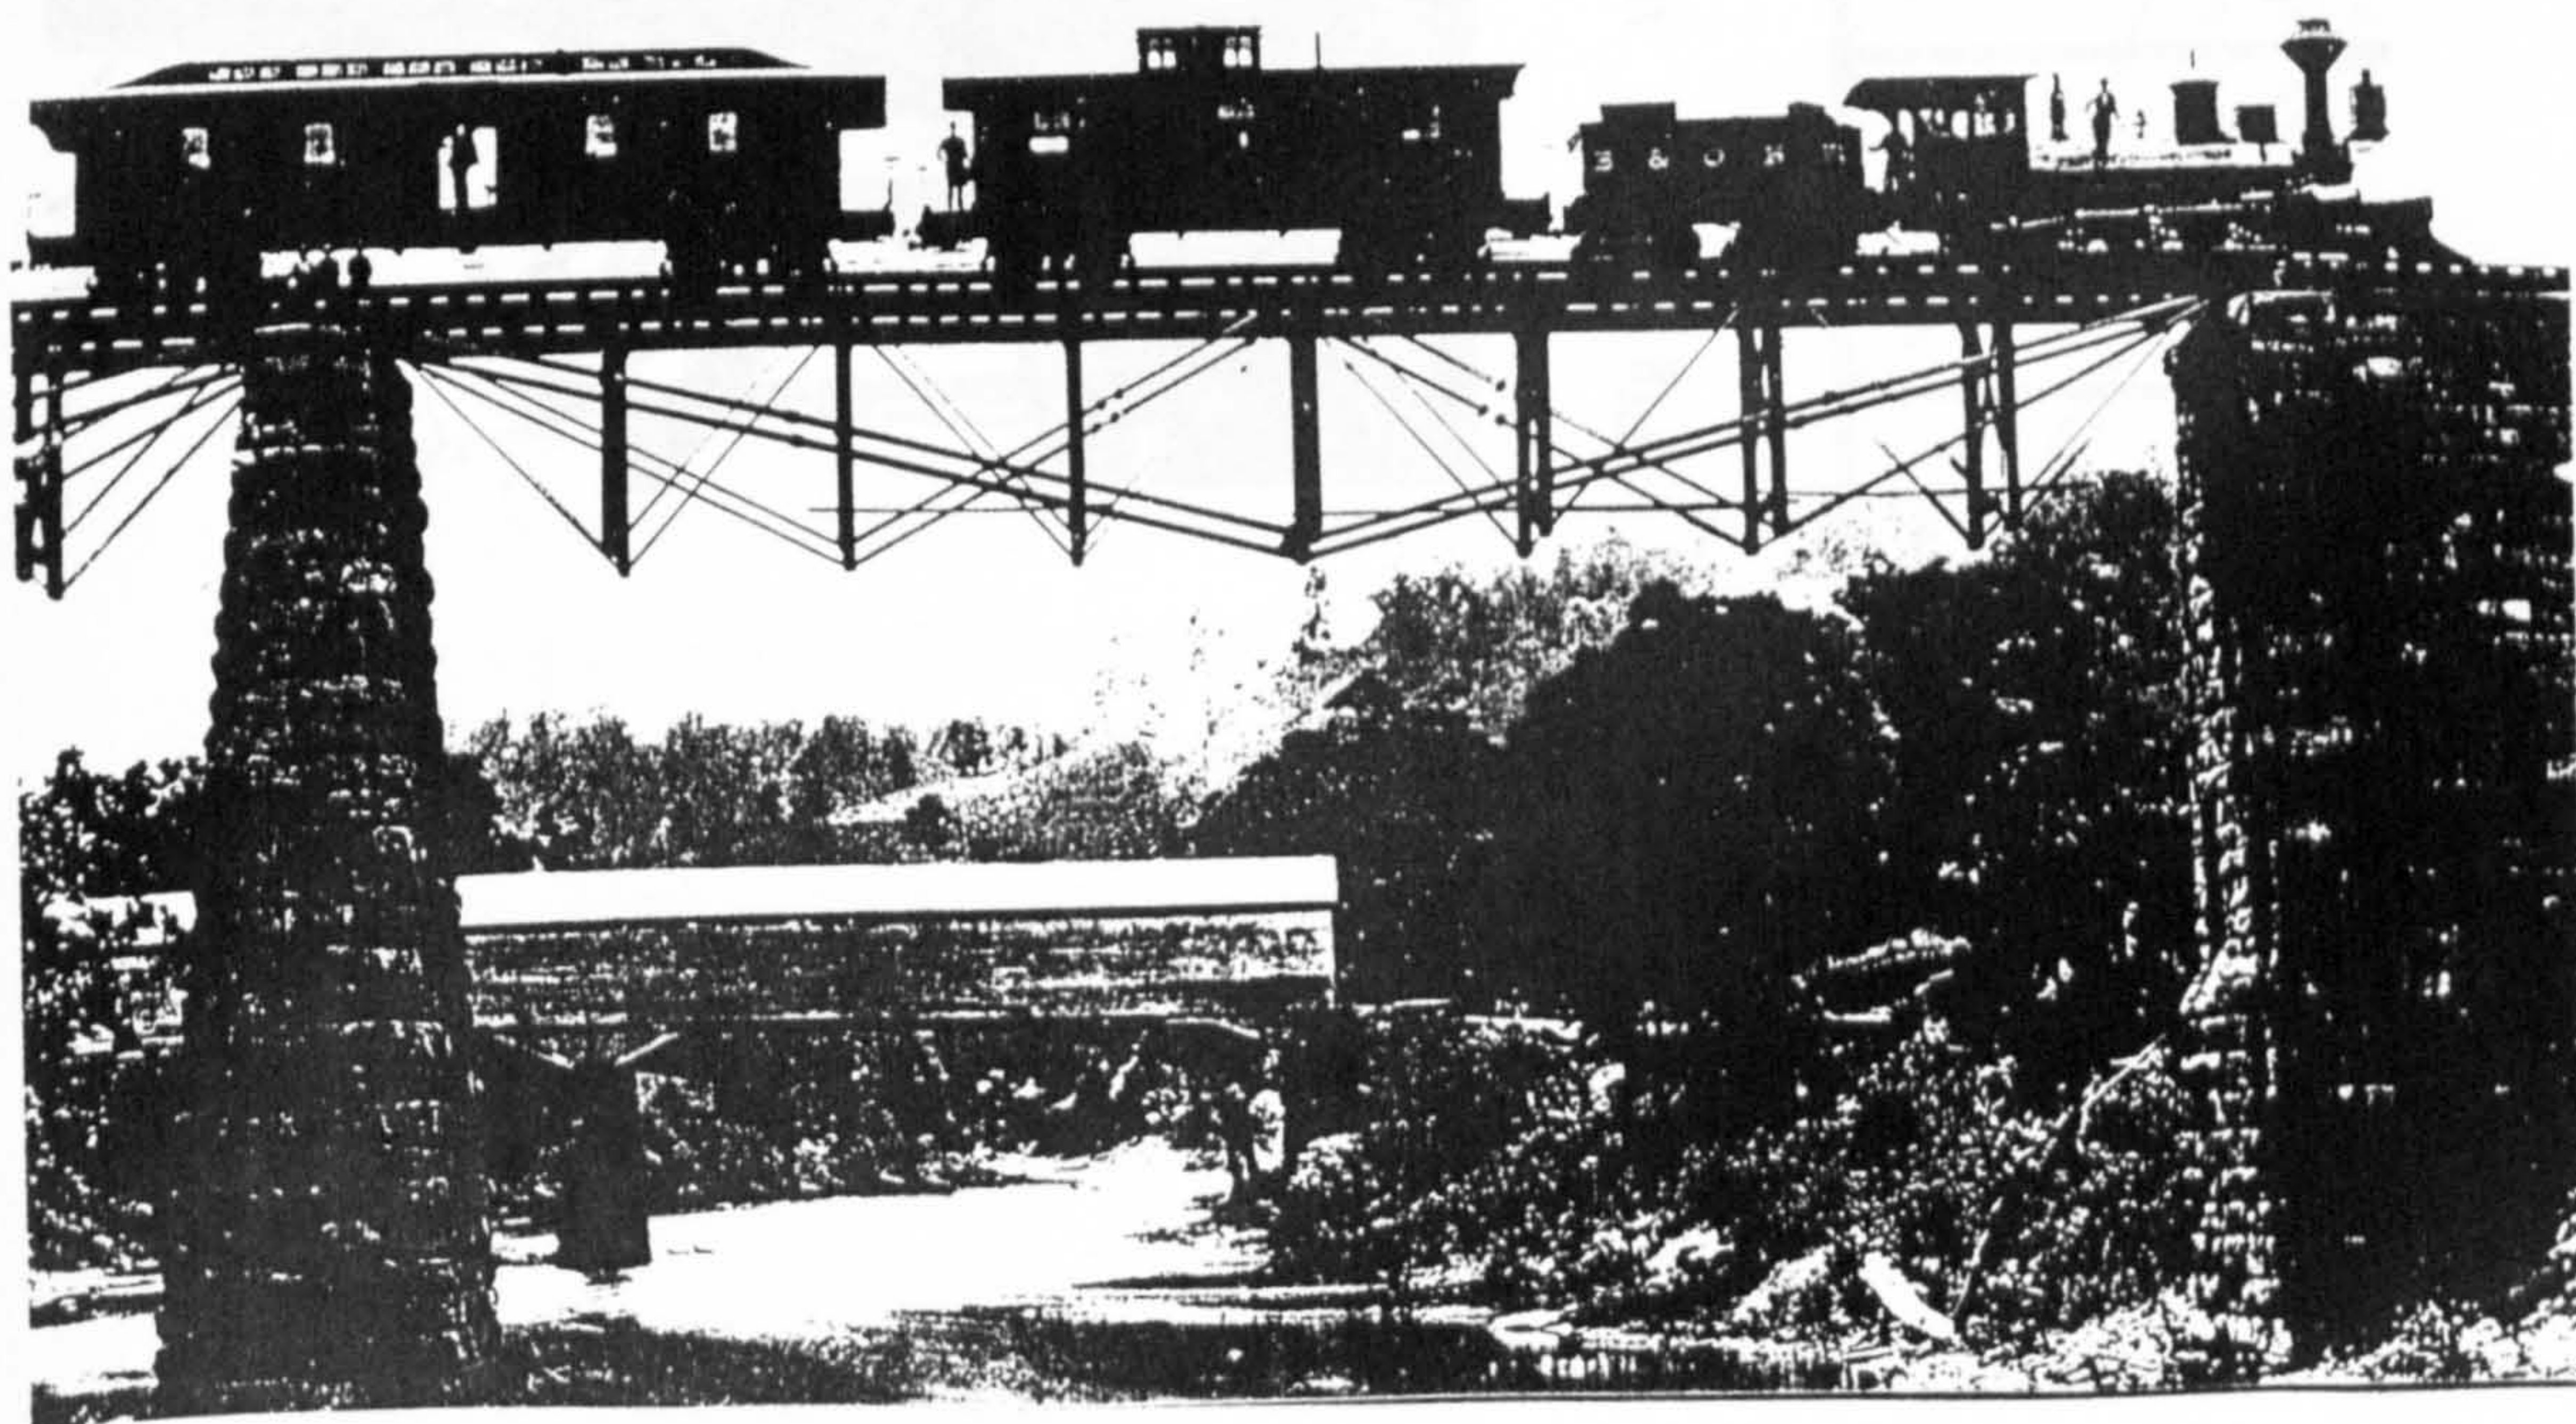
Albert Fink's truss, over the Monongahela River west of Clarksburg, West
